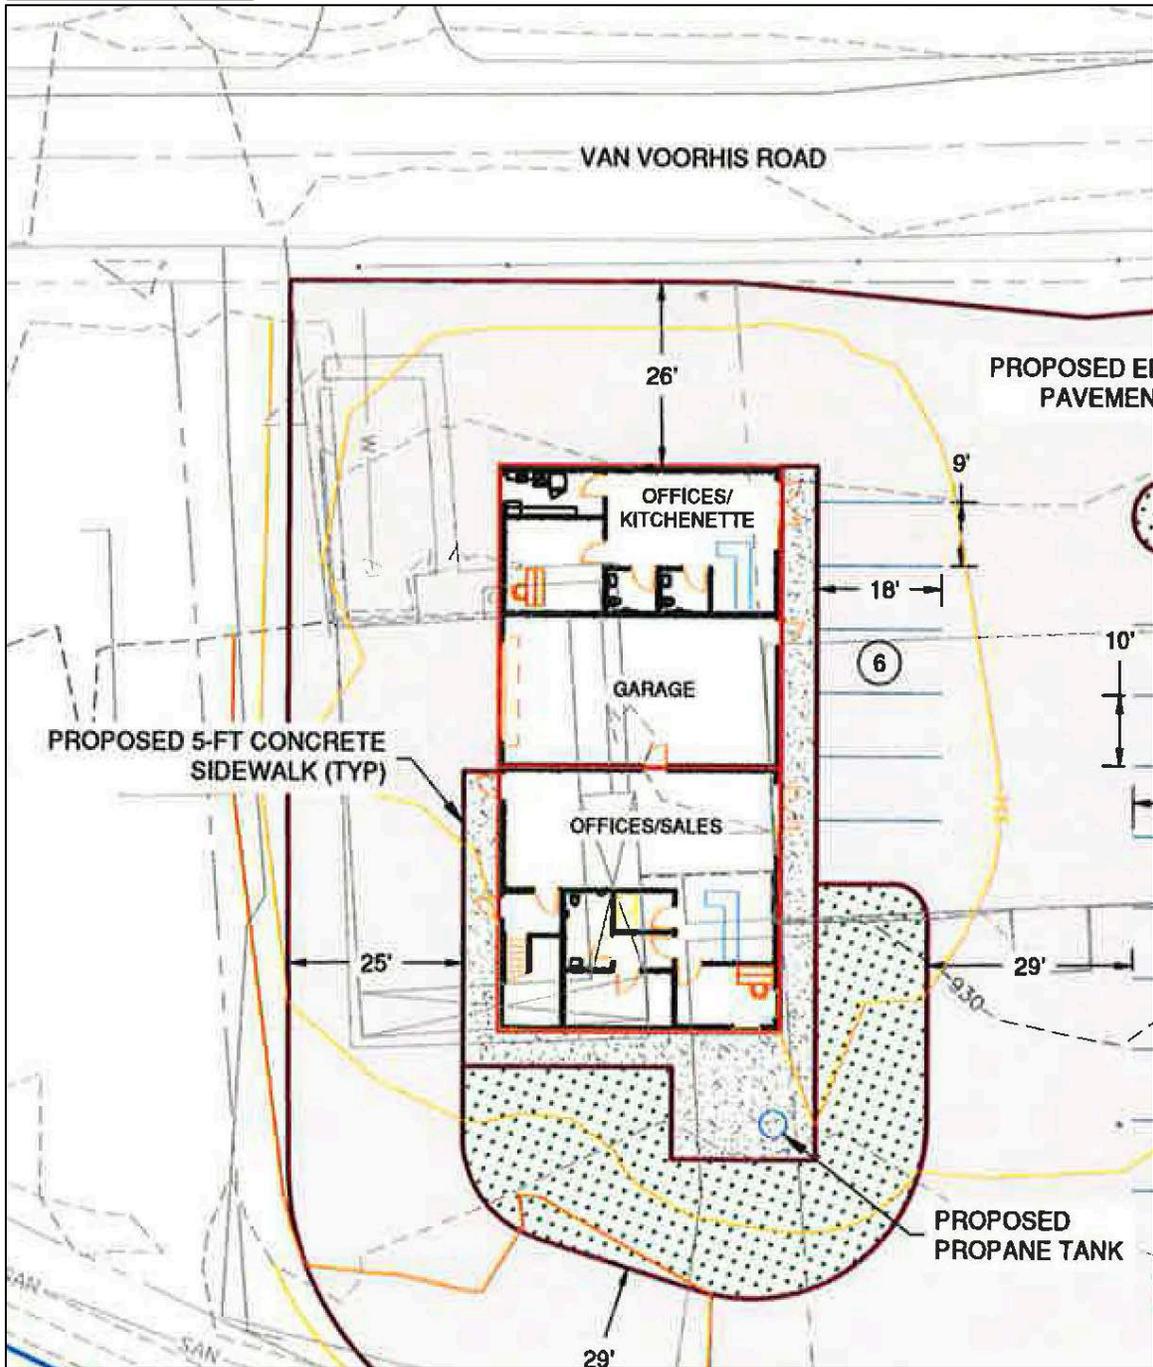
Exhibit A: Inset of the project site as a whole showing the area where the proposed building will go. (not to scale)
